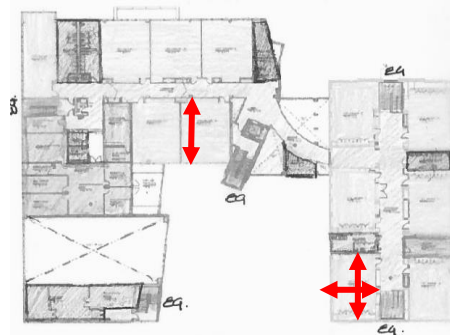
Daylighting- Different depths of classrooms in Horace Mann Elementary School might be due to orientation. The east west facing classrooms are shallower than south facing classrooms (Author's Diagram)
